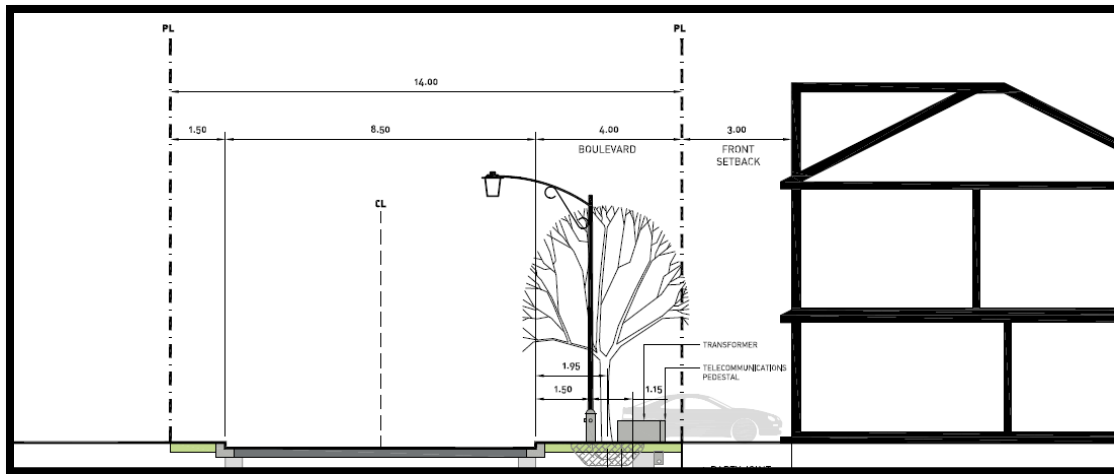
14.0 m window street ROW for 2275 Mer Bleue Road
